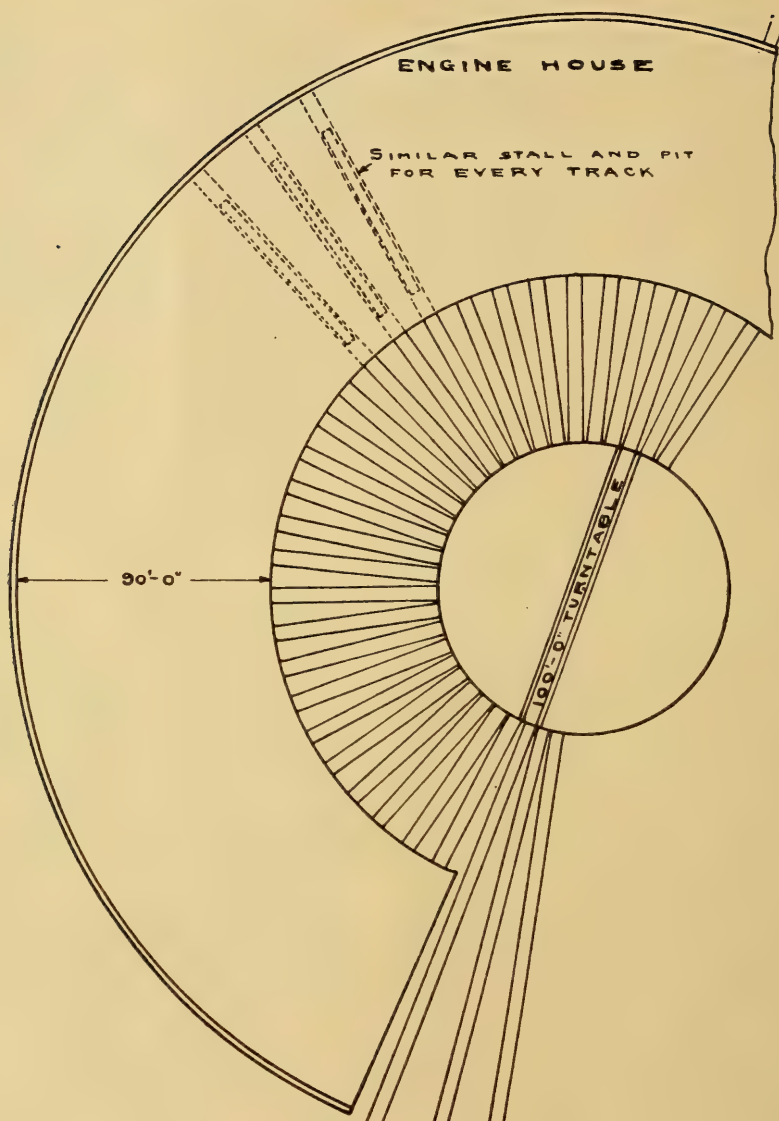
TYPICAL ENGINE HOUSE LAYOUT.
